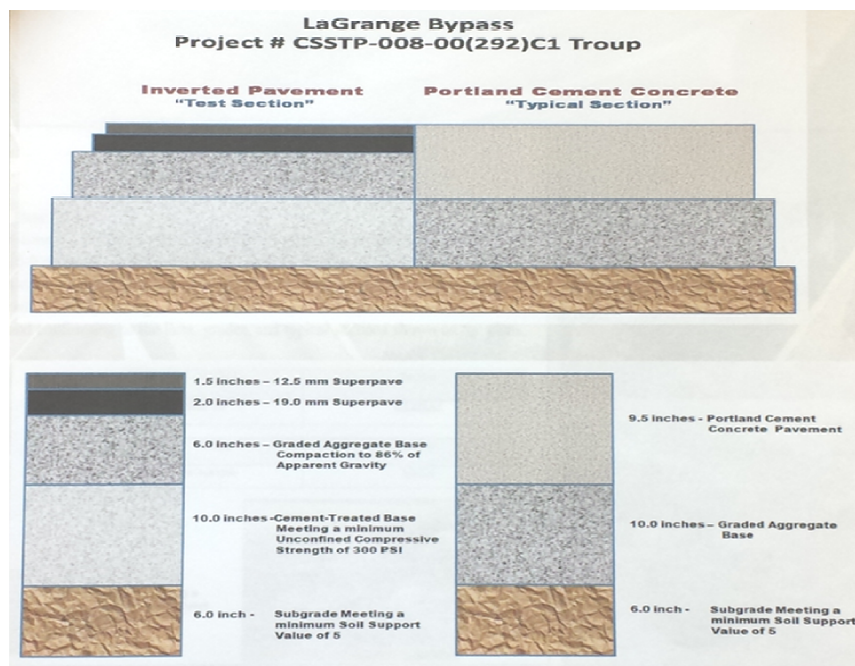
LaGrange scheme Layers of Inverted Pavement and Typical section
